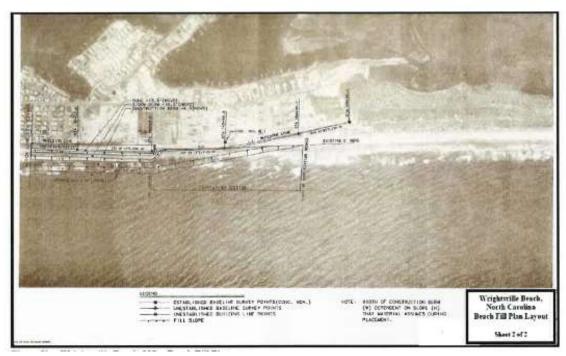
Wrightsville Beach, NC —Beach Fill Plan.
